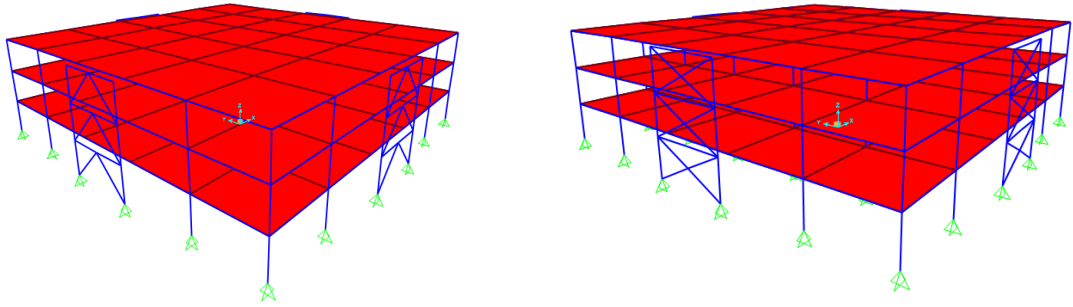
3-Story Strengthened Building Model with Inverted V- and X-Type External Steel Braces
